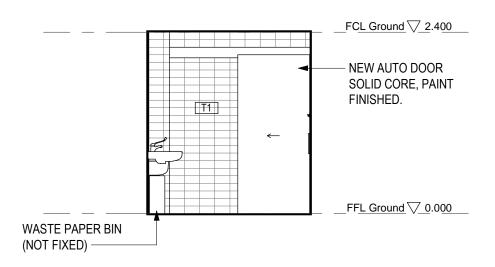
DETAIL ELEVATIONS PARENTS ROOM DEMOLITION
